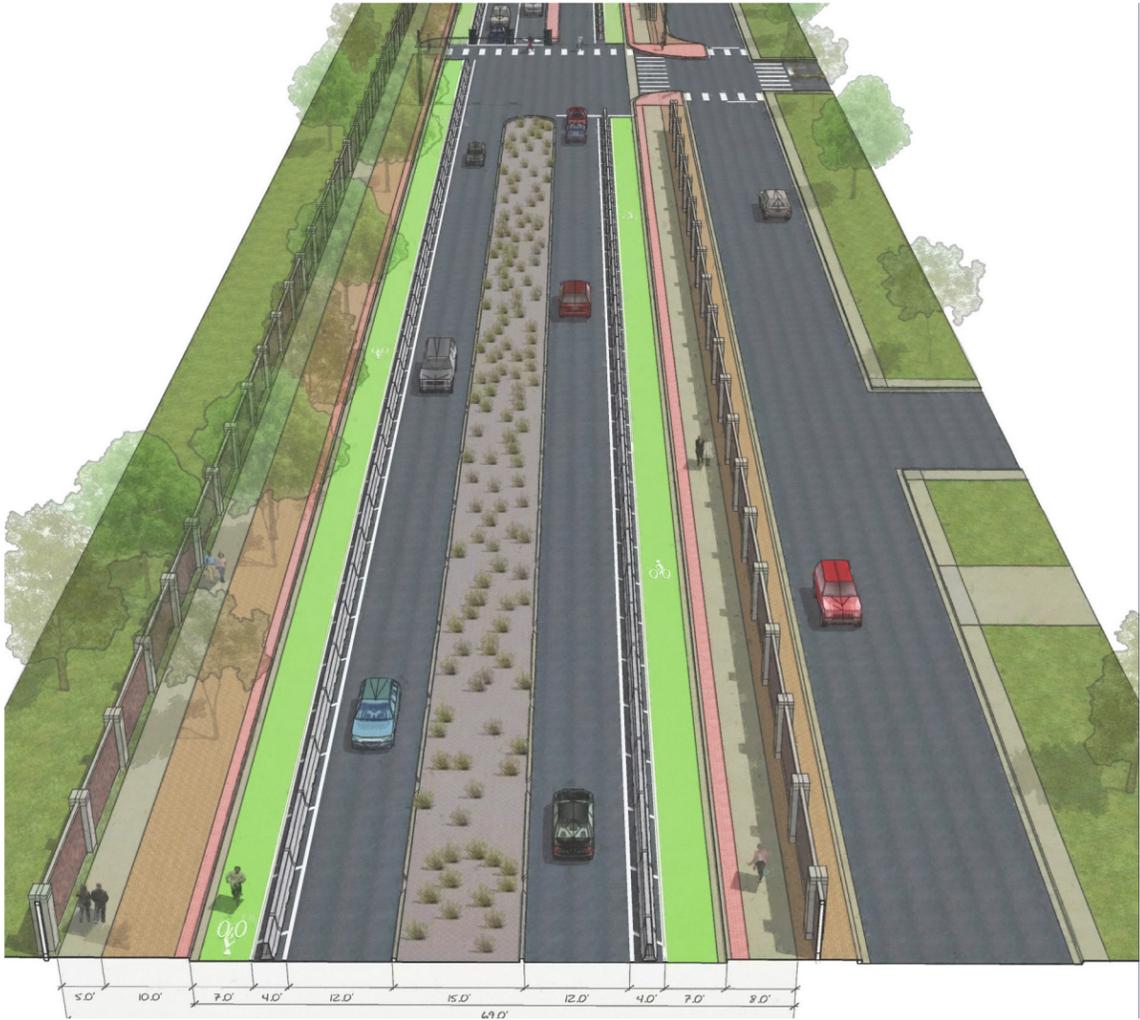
3D Rendering of Concept Improvements at N Lamar Street (Looking East)
